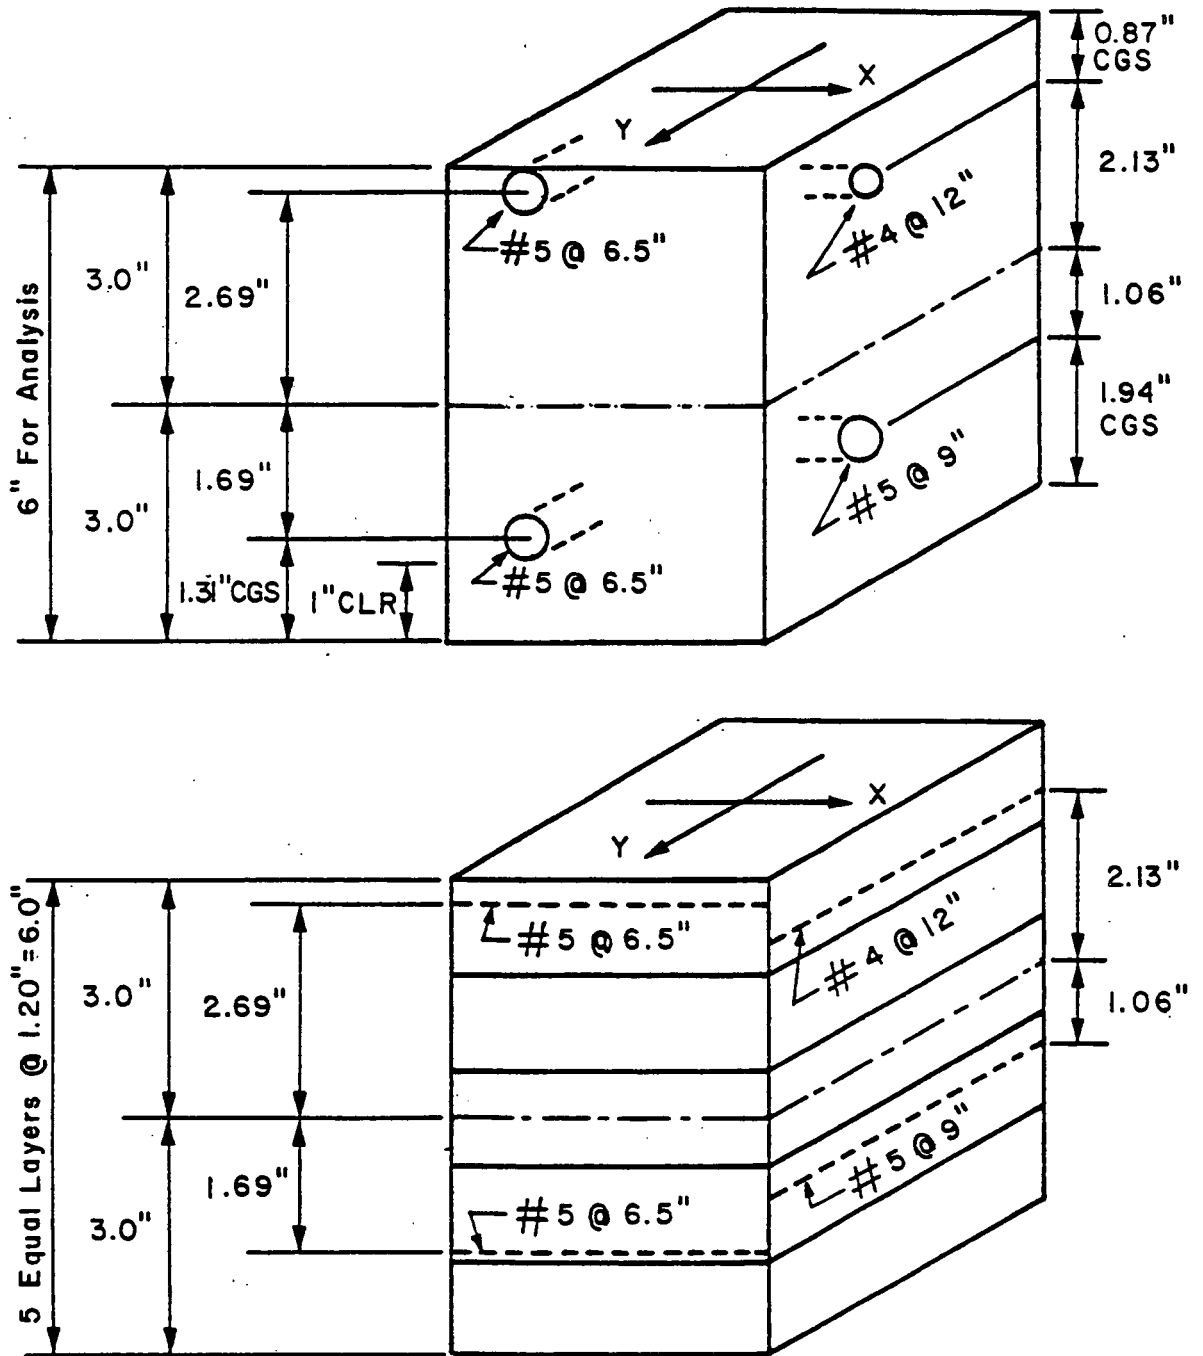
Slab Details (top) and Finite Element Idealization (bottom) for Bridges 10 and 11 Deck Types B and D (X and Y Indicate Longitudinal and Transverse Directions Respectively)
